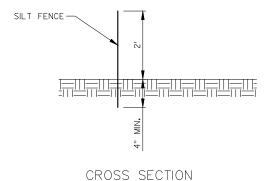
DETAIL FOR ASPHALTIC SHOULDER AND SILT FENCE AT BEAM GUARD
